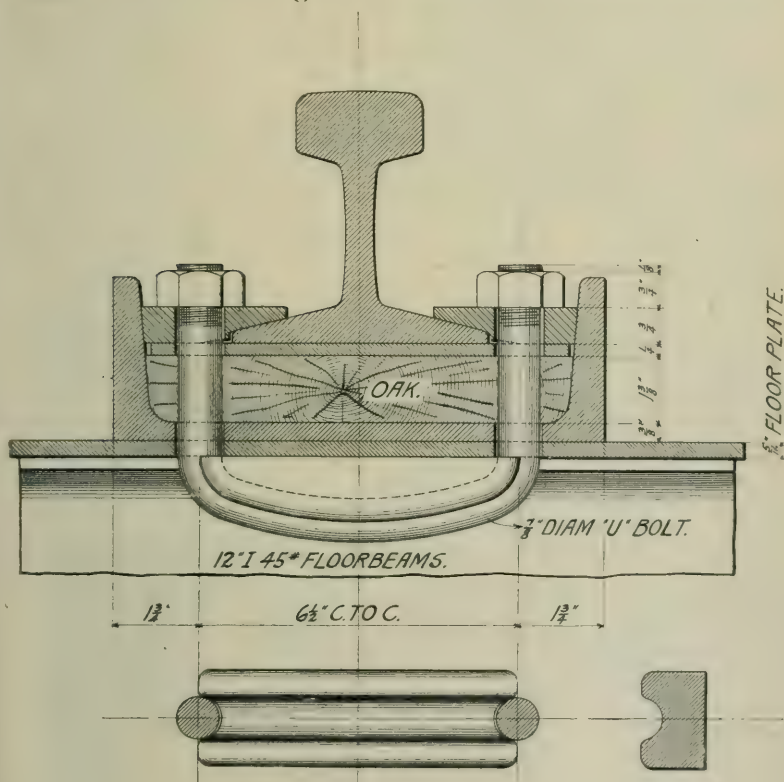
RAIL FASTENINGS—C. M. ST. P. RY.
